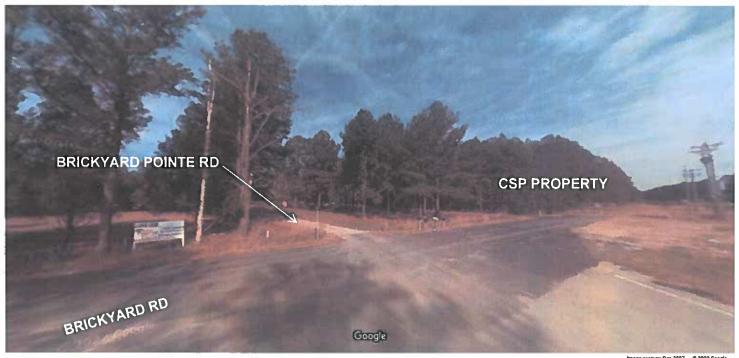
EXHIBIT I.c - BRICKYARD POINTE ROAD 2 LANE, OPEN SECTION, GRAVEL ROAD
